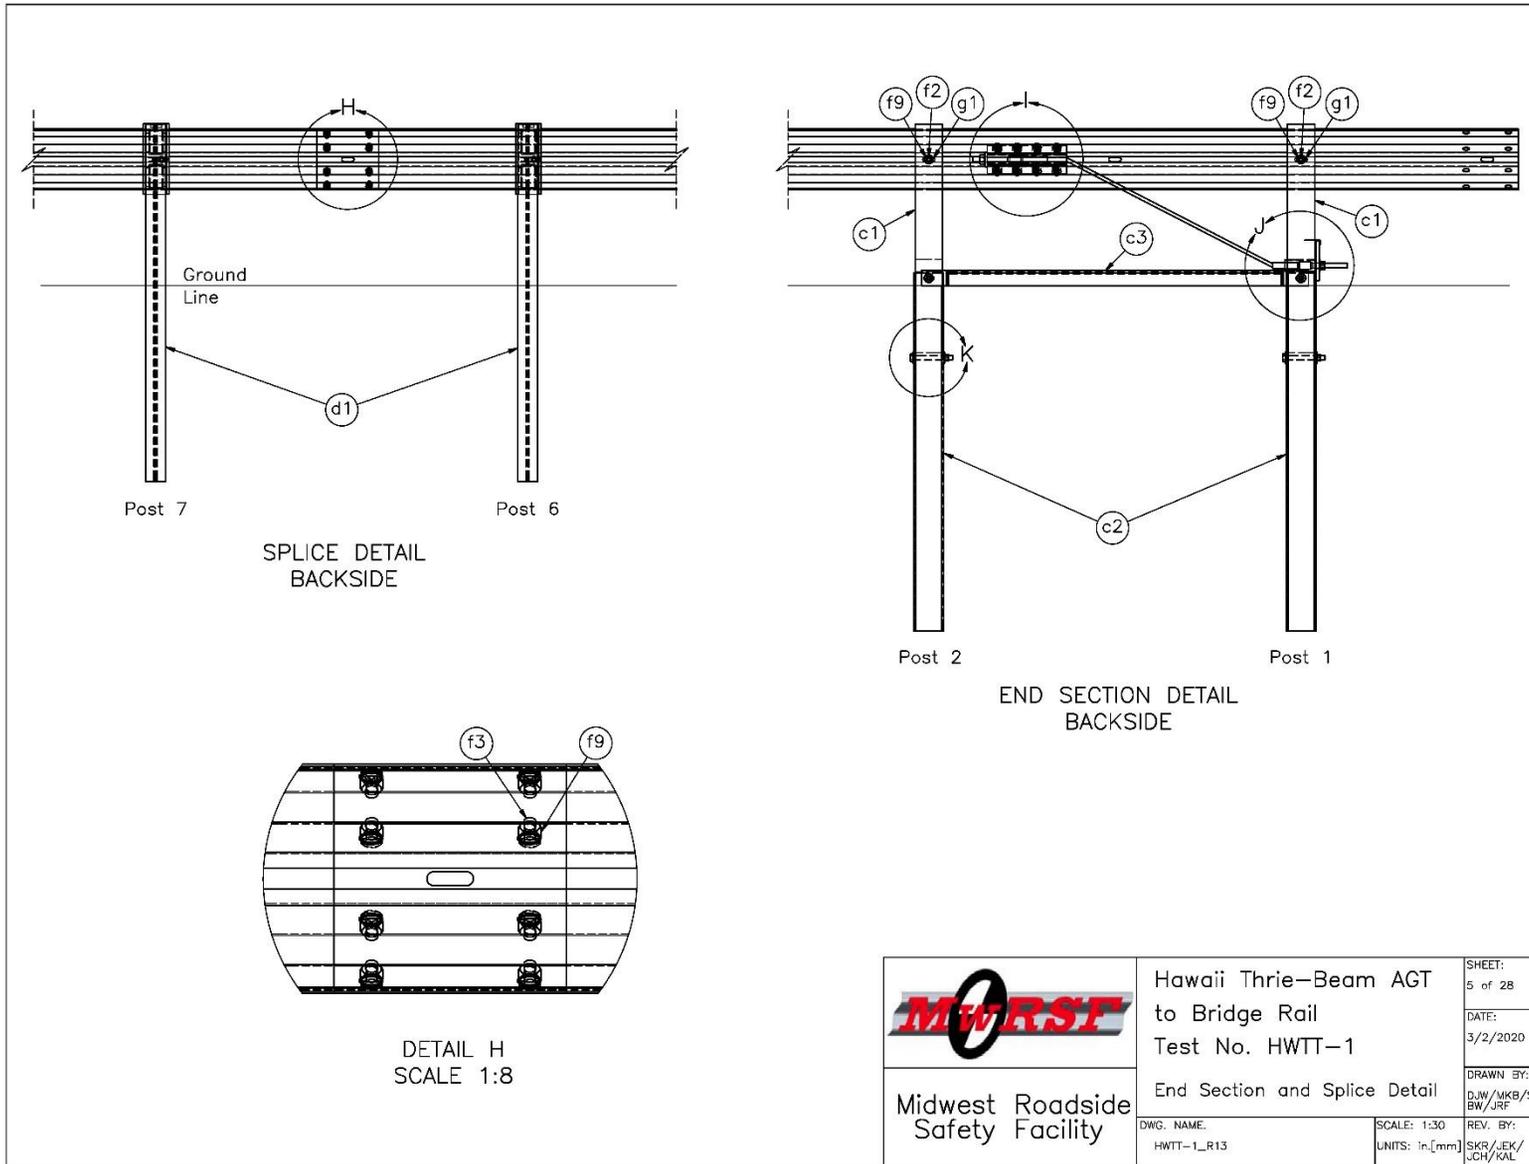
Guardrail End Section and Splice Detail, Test Nos. HWTT-1 and HWTT-2
